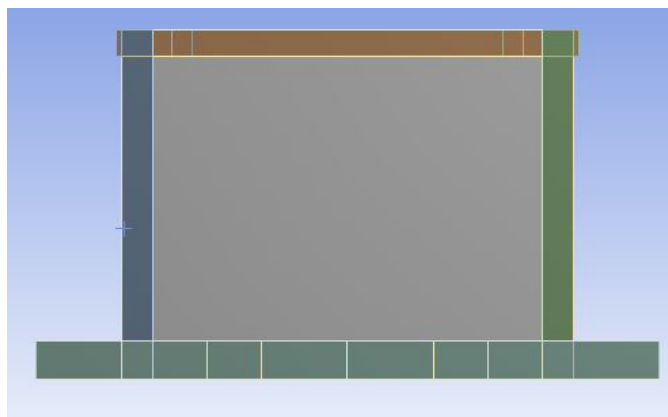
Unstiffened Steel Plate Shear Wall (SPSW)
